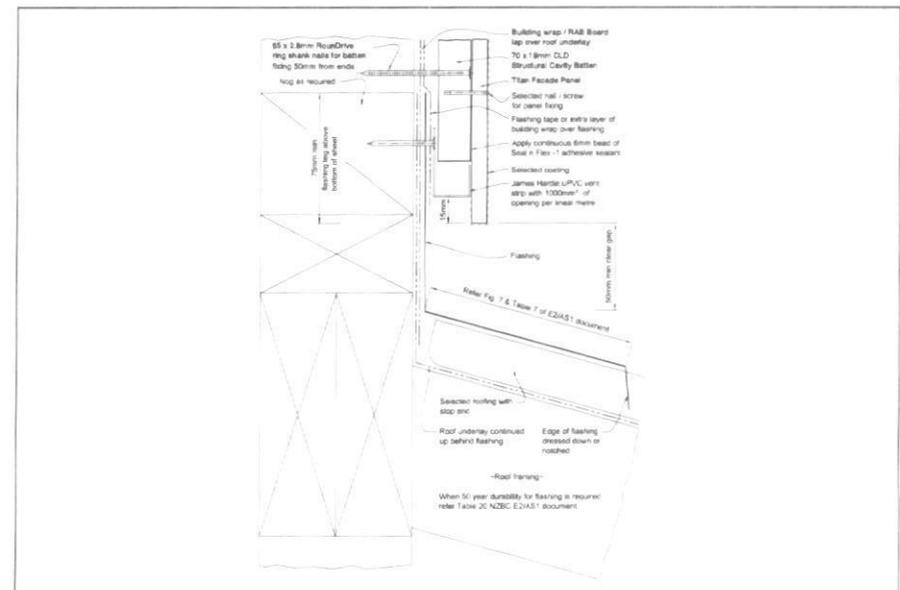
ONE PIECE APRON FLASHING JOINT
